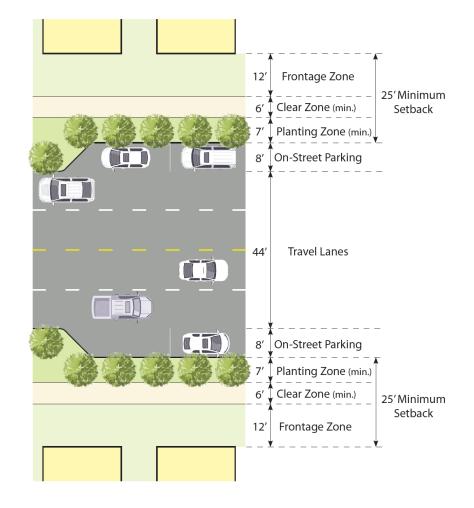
FRONTAGES ON MAJOR STREET WITH PARKING
